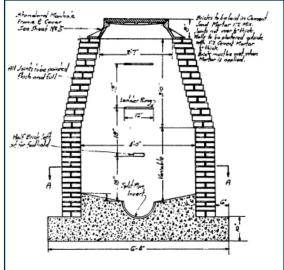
Typical NJDOT drainage inlet and brick manhole.
